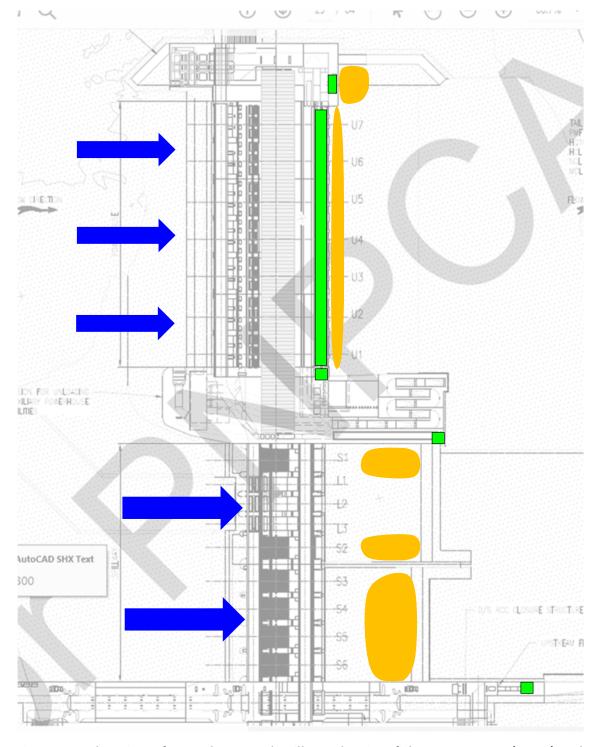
Plan view of powerhouse and spillway showing: fishway entrances (green) and zones of fish attraction (orange) at moderate spillway discharge.
